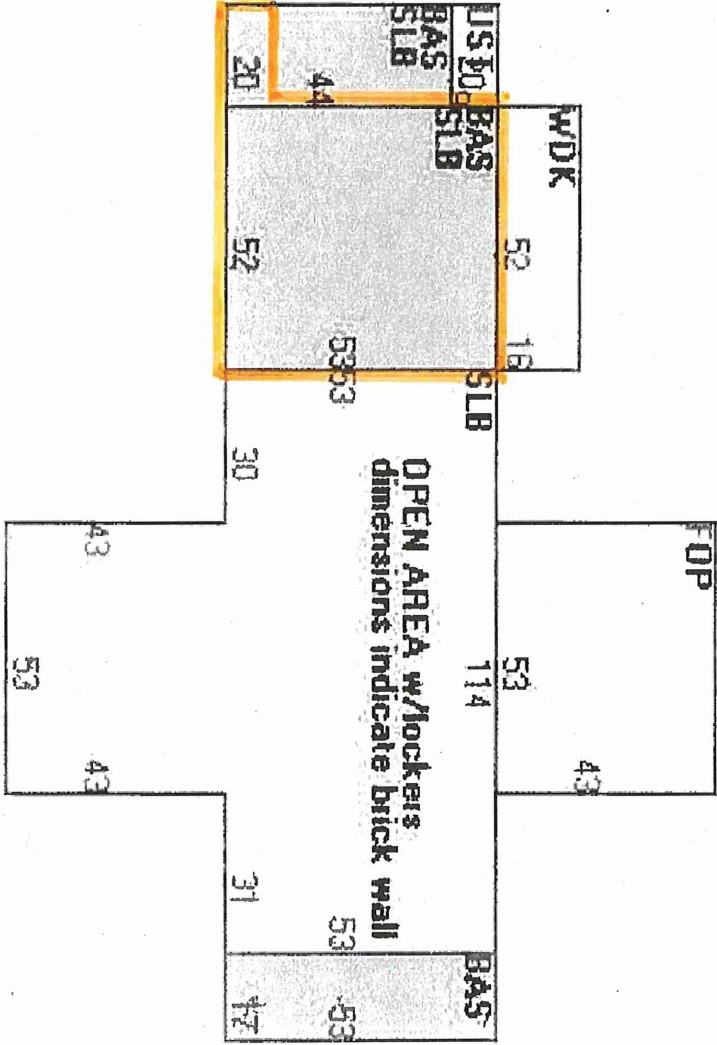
EXHIBIT B: FLOOR PLAN OF LONGSHORE PAVILION
